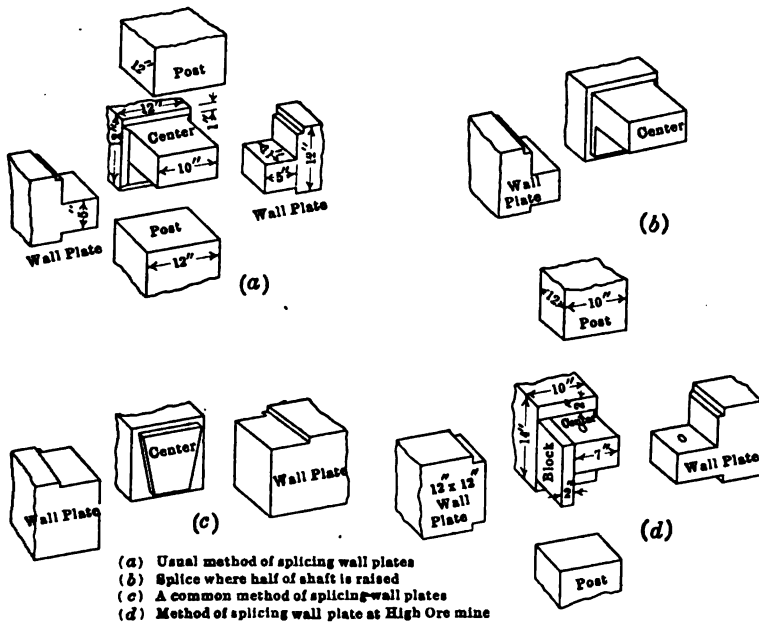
Methods of splicing wall plates. (Trans. A. I. M. E.)
